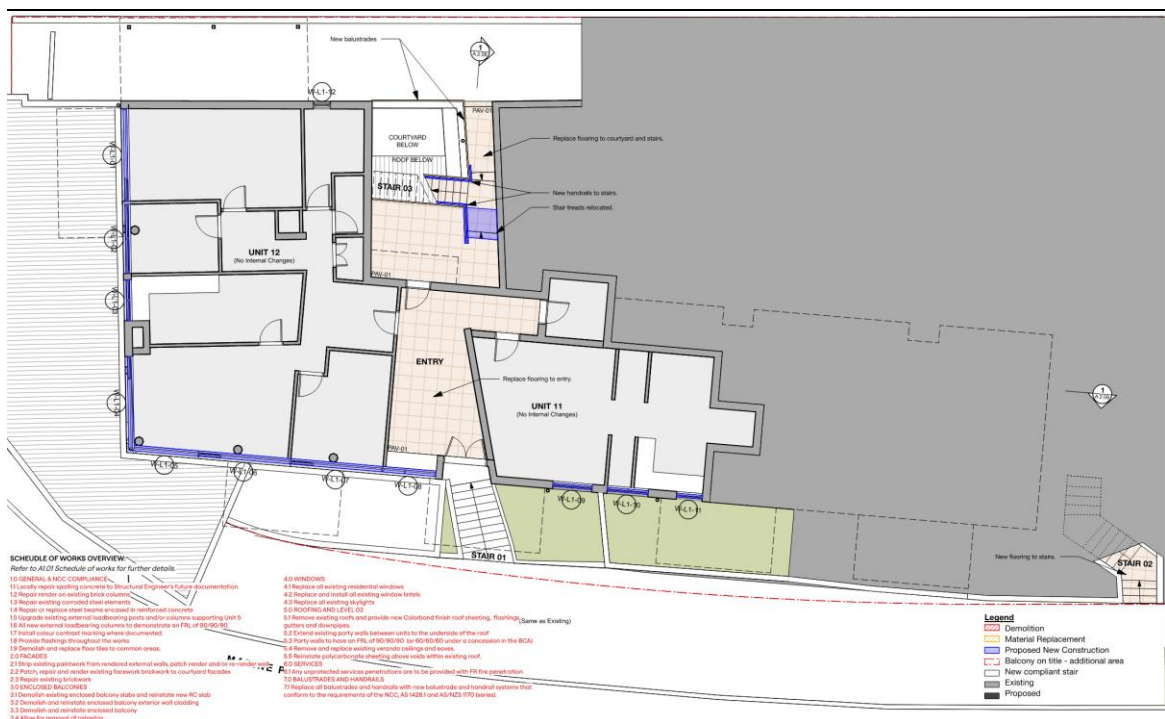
Proposed Level 01 Plan (Source: Hill Thalys – 05/12/2025)
